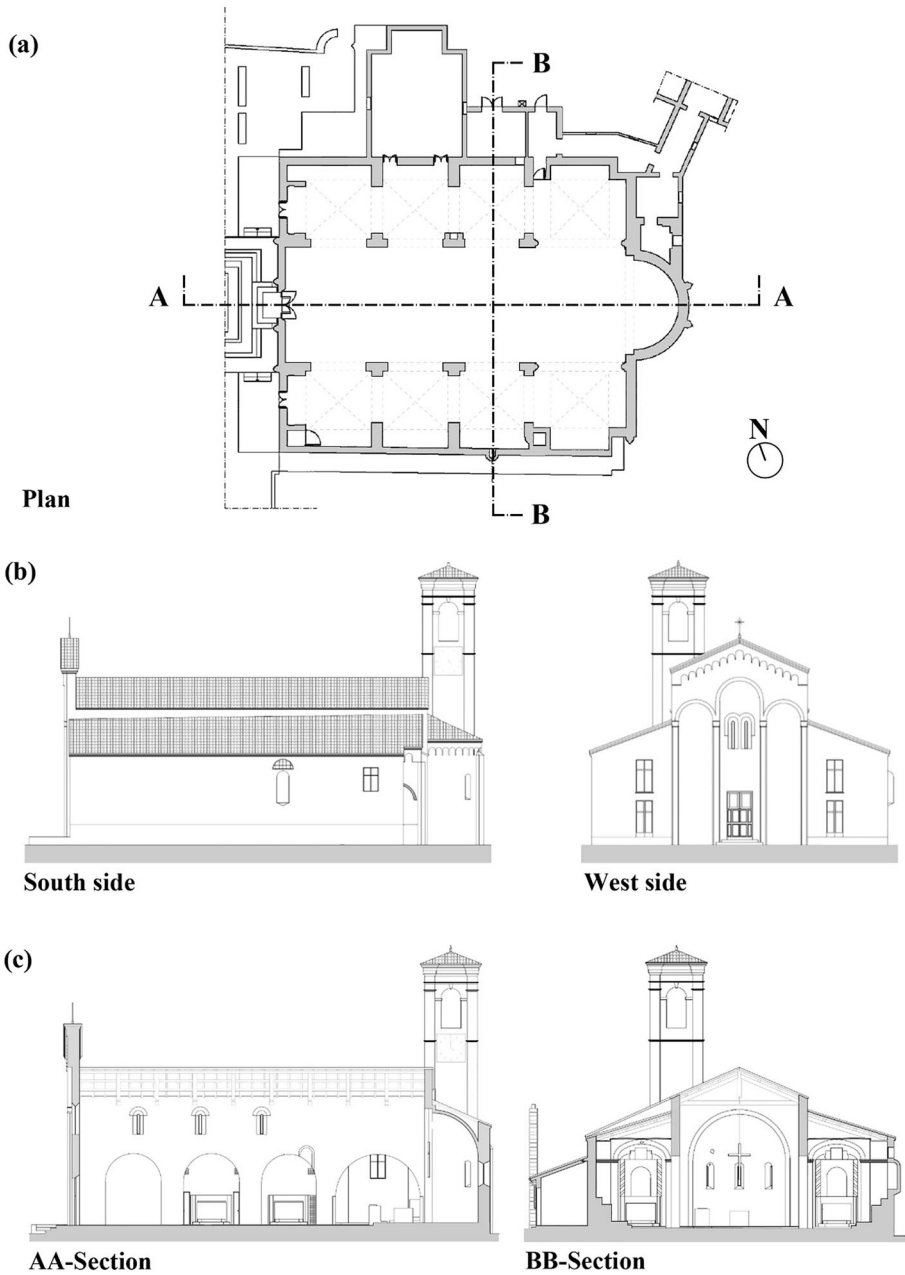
San Fiorentino Martire church: a plan, b elevation views, c sections
